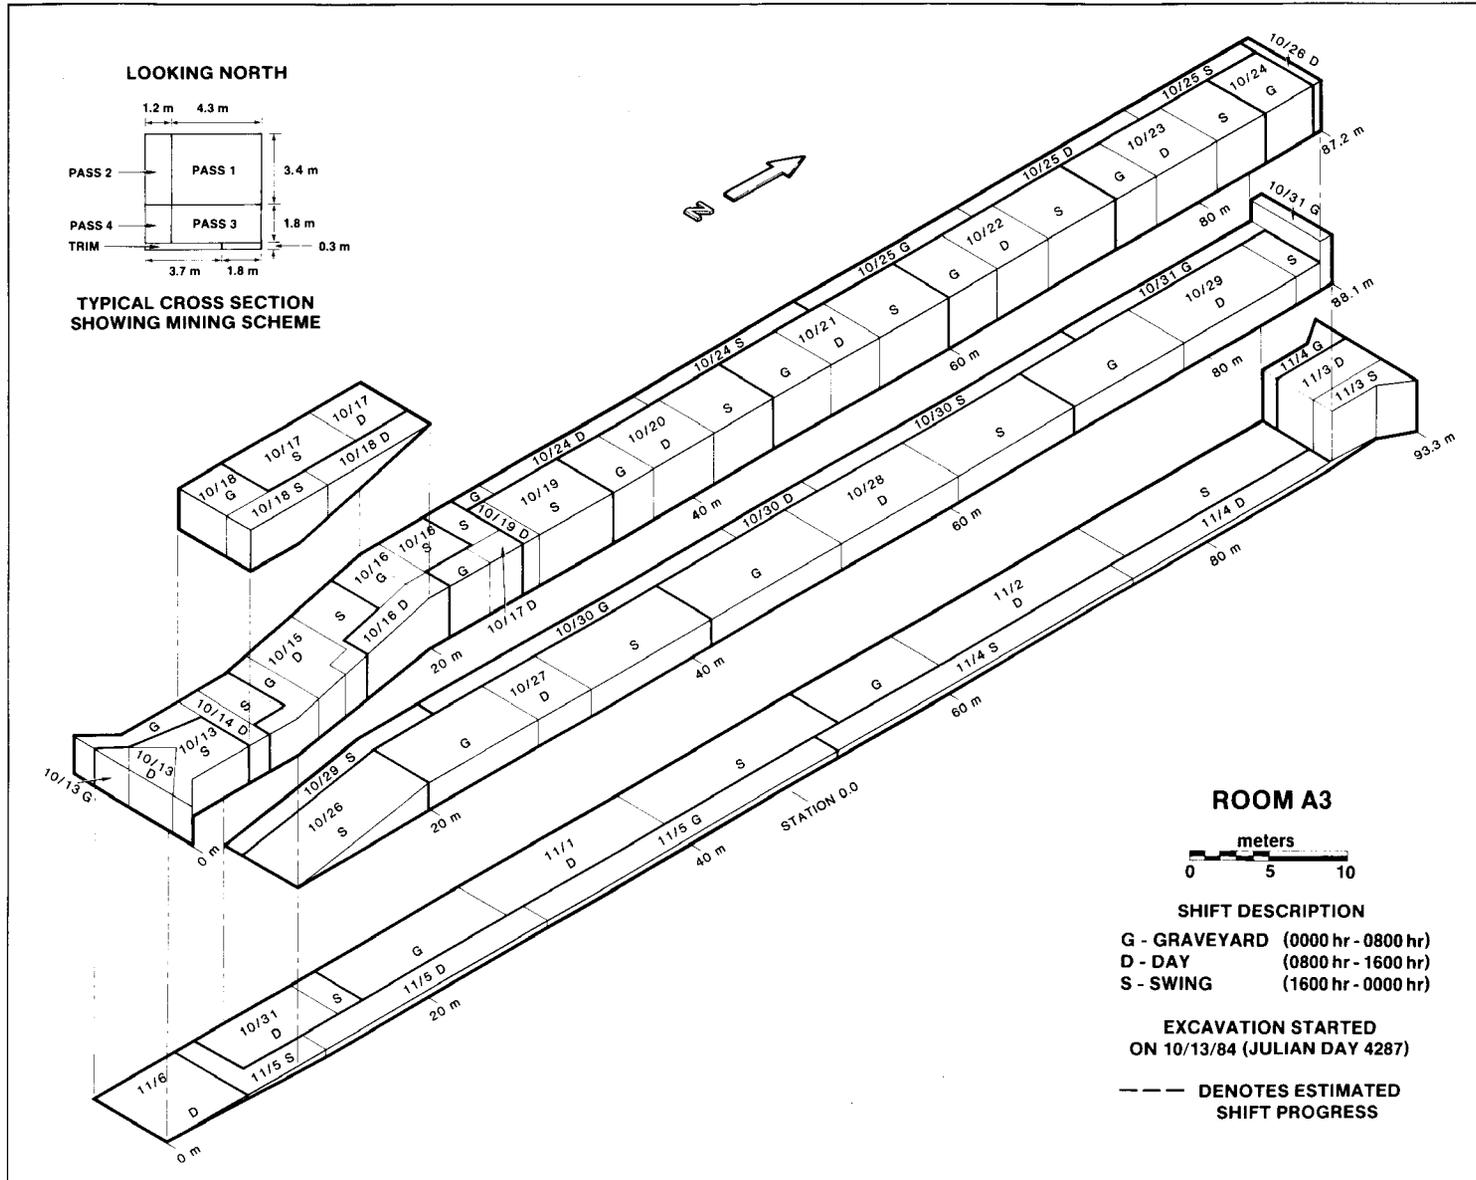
Isometric of Multipass Mining of Room A3
